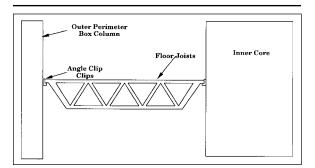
Unscaled schematic of WTC floor joints and attachment to columns.
